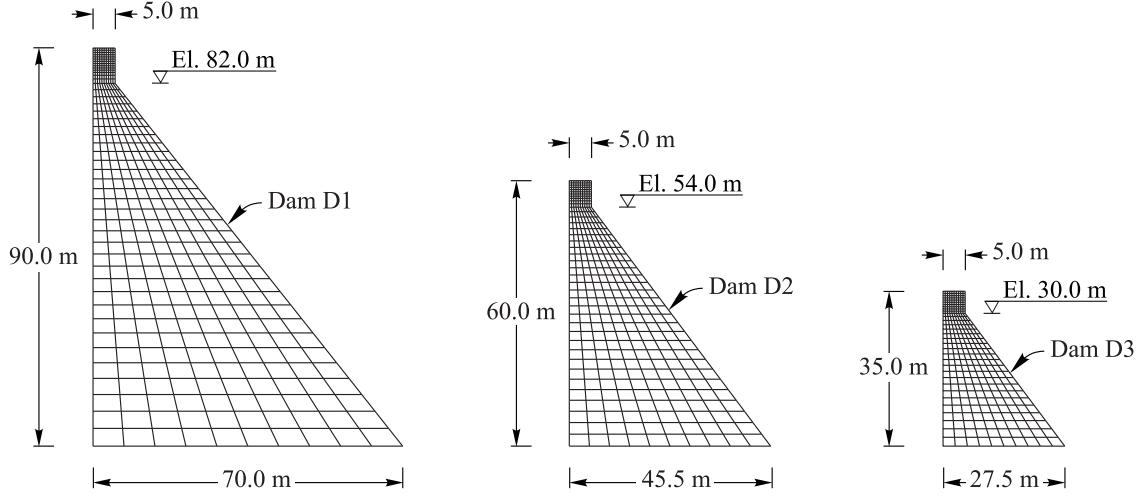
Geometry and finite element models of gravity dam cross-sections D1, D2 and D3.
